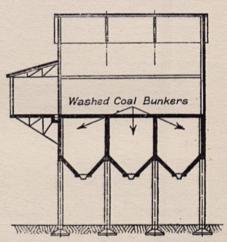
Washery Building with CANTILEVERED SUPERSTRUCTURE.
